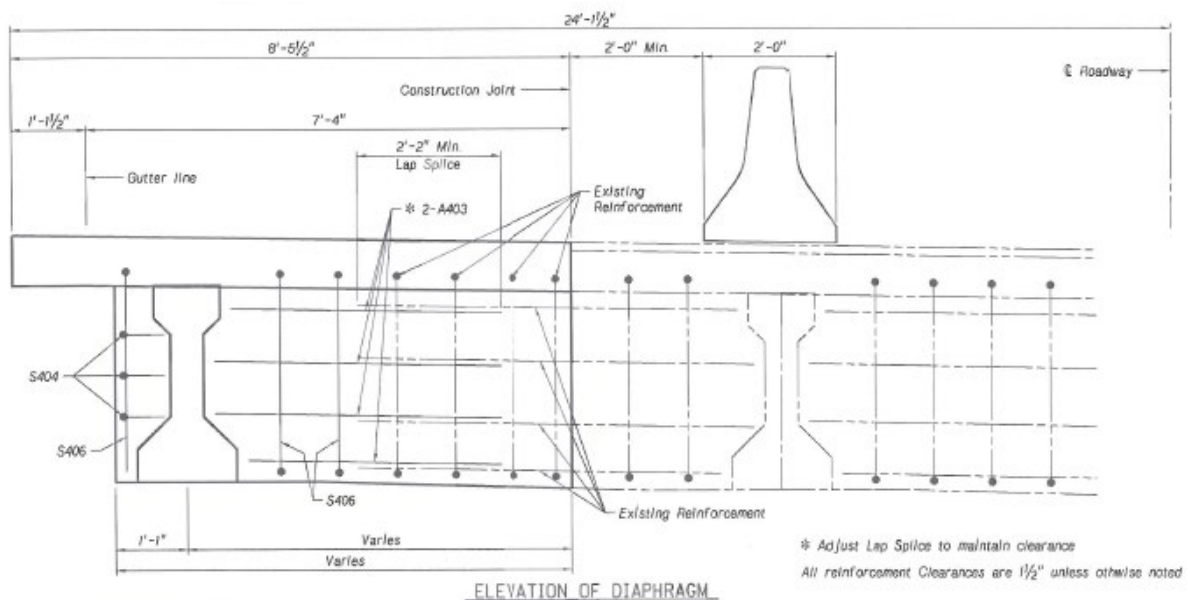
Girder replacement procedure, splicing diaphragm reinforcement, from the repair documents of I-680 over US-75 Bridge, courtesy of NDOT
